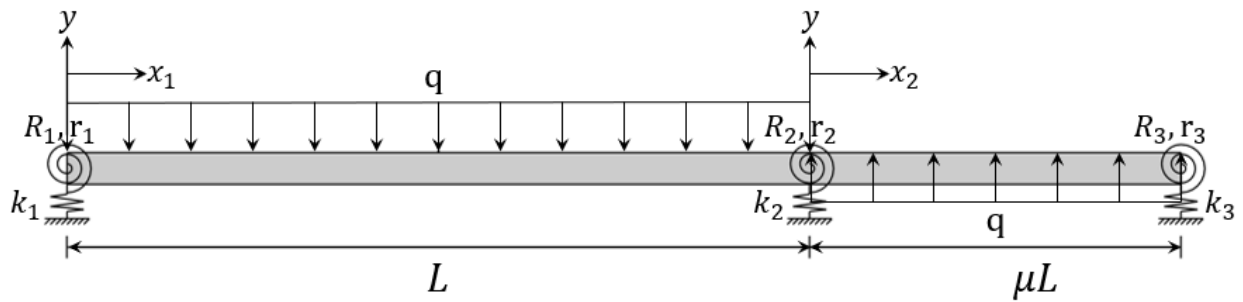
A two-span, rotationally restrained floor sitting on beams under uniformly distributed load
